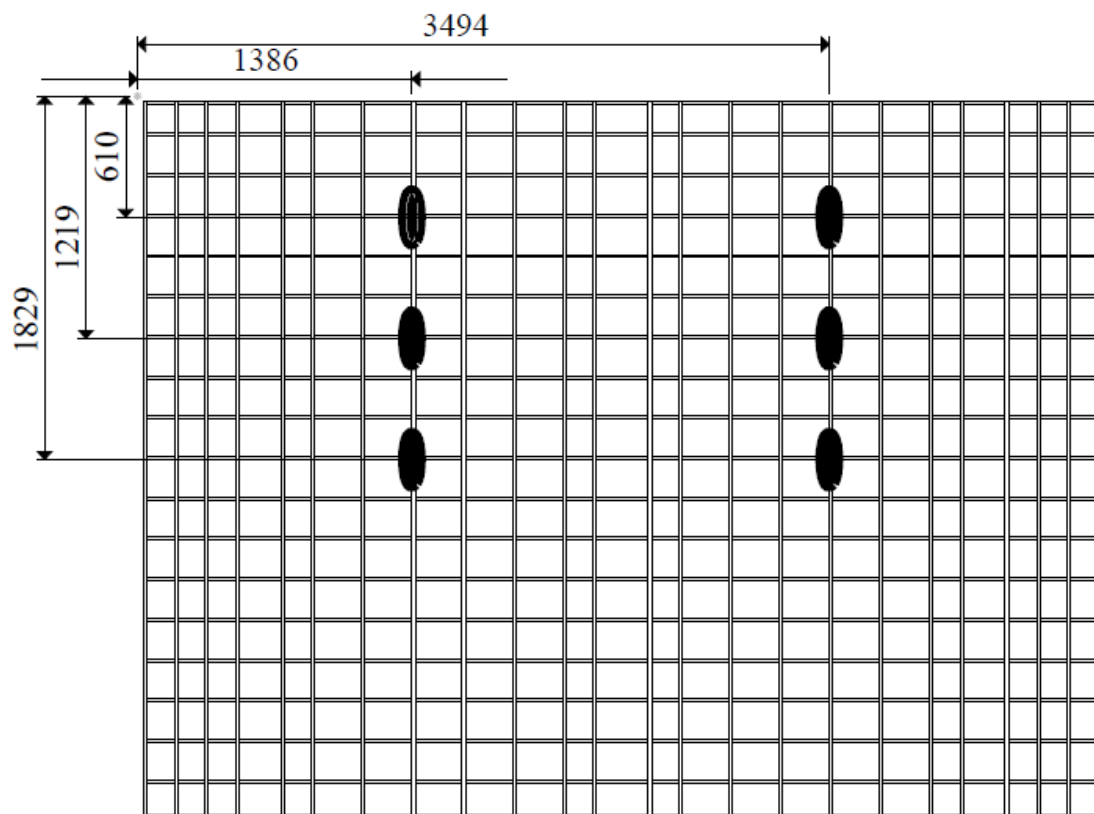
Layout of strain gages attached to top longitudinal steel reinforcement
